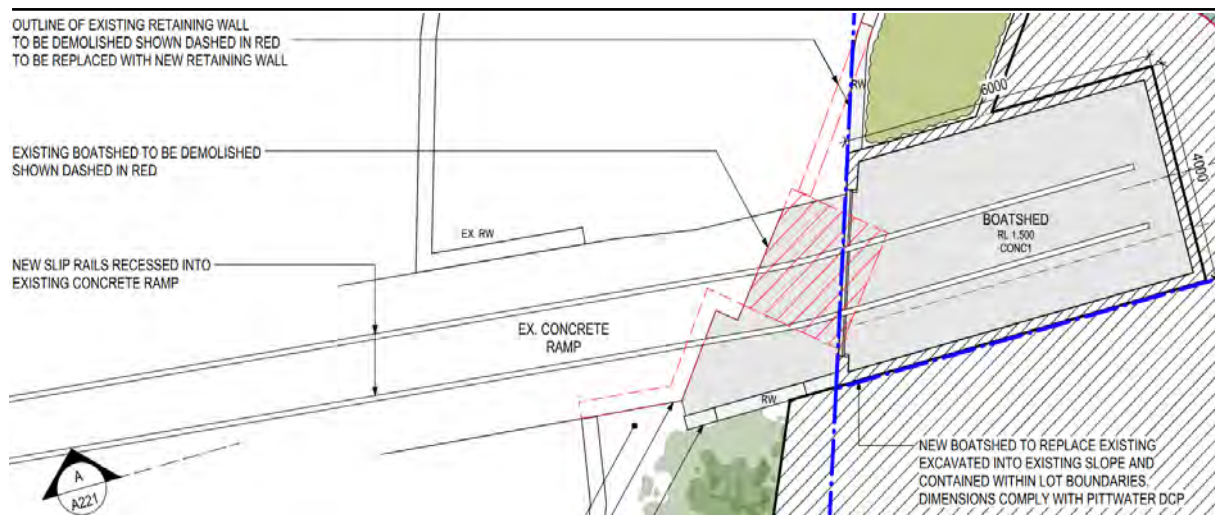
Plan View of Proposed Development (extract from drawings by MHDP Architects (2021, provided in Appendix B))
